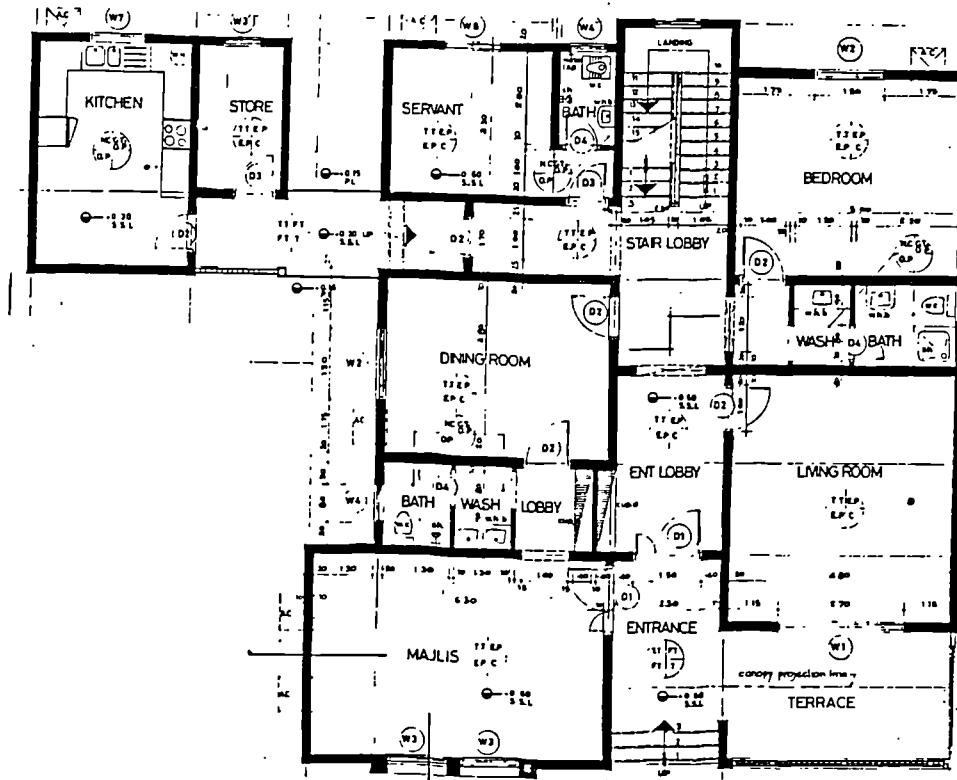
Ground floor plan of low-cost house in 1990s.
